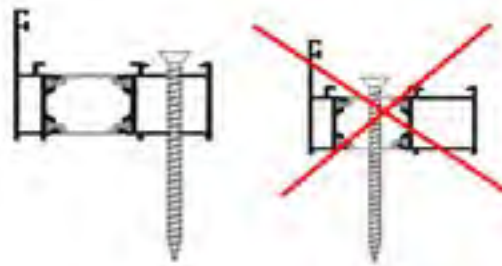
Anchor in thermo-break profile (Technical Manual of Windows Installation, POVAS 2019)
